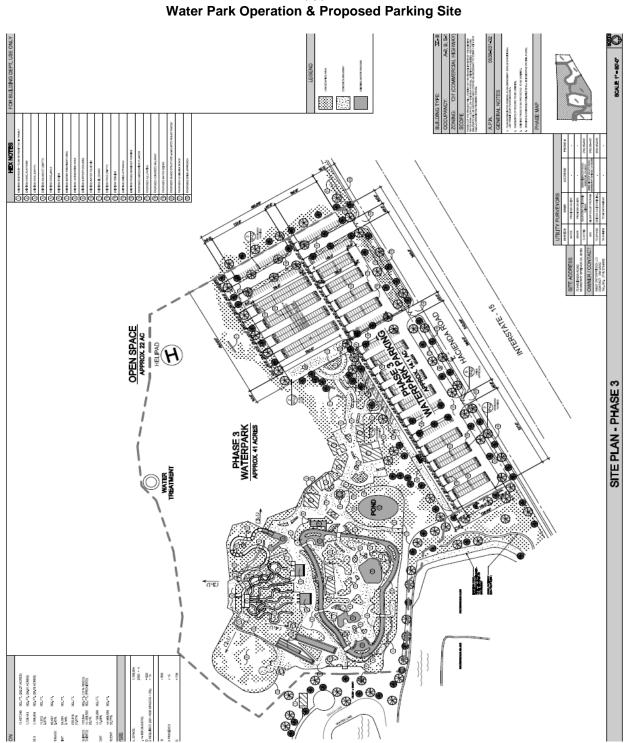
Phase III Nater Park Operation & Proposed Parking Site
